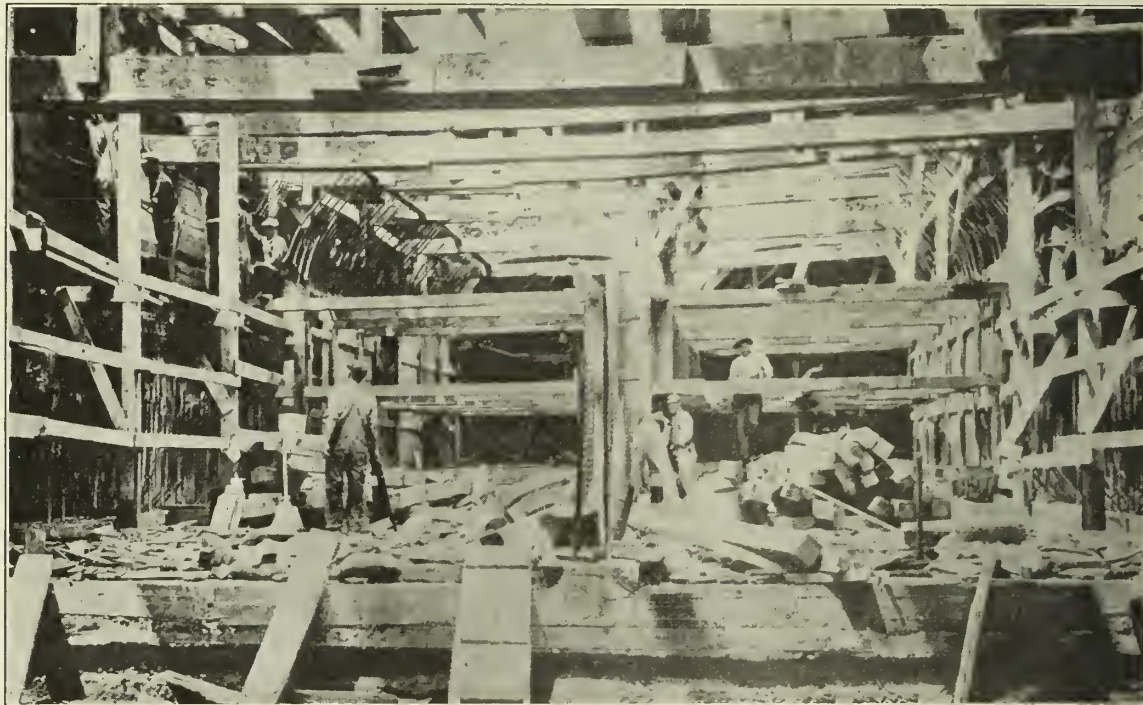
Boylston Street Subway, Section 1. Construction in the Fens, below the Level of the Creek Bed.
